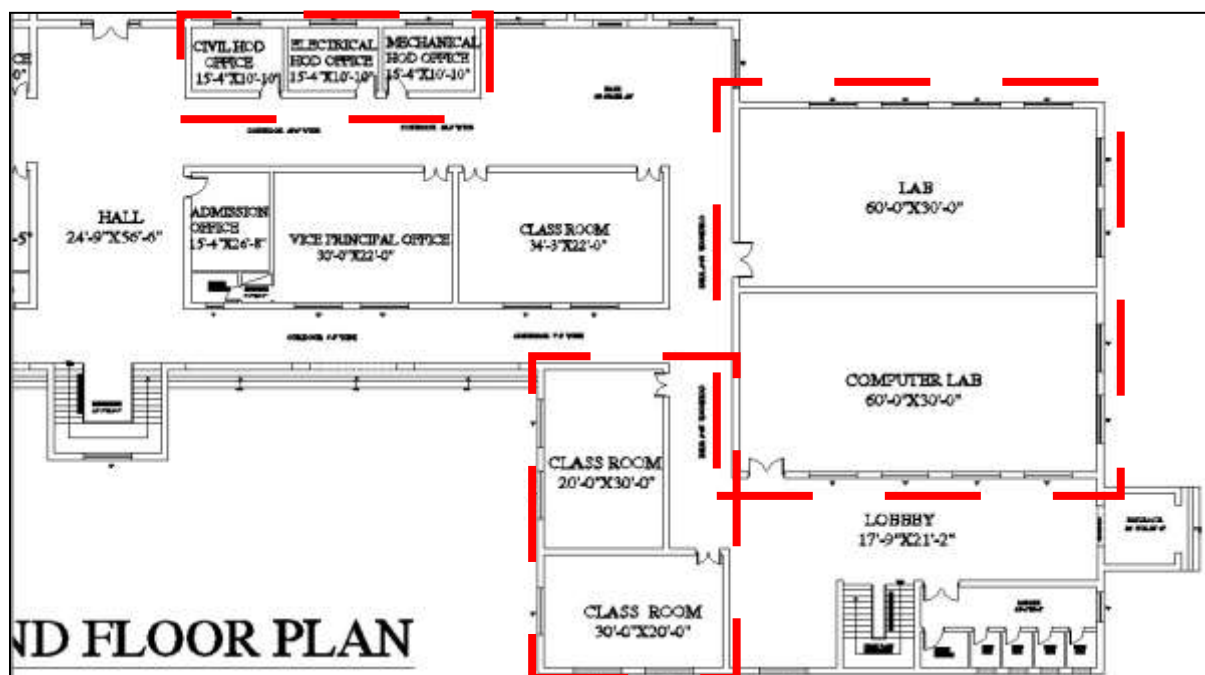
Ground Floor West Wing Plan of the Government College of Technology
